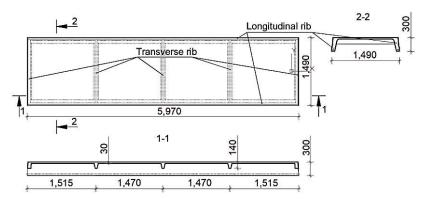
Top view, longitudinal and transverse section of a ribbed panel PNS-12 (PK-01-111, 1961 *Dimensions are in mm.
